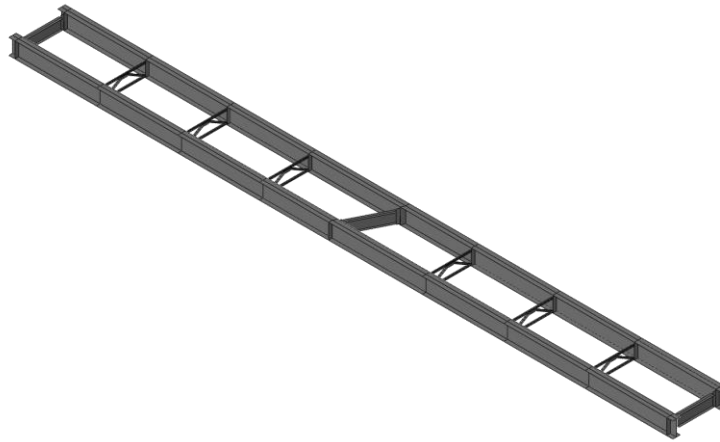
FE-model of Bridge over road E6 without any formwork attached
